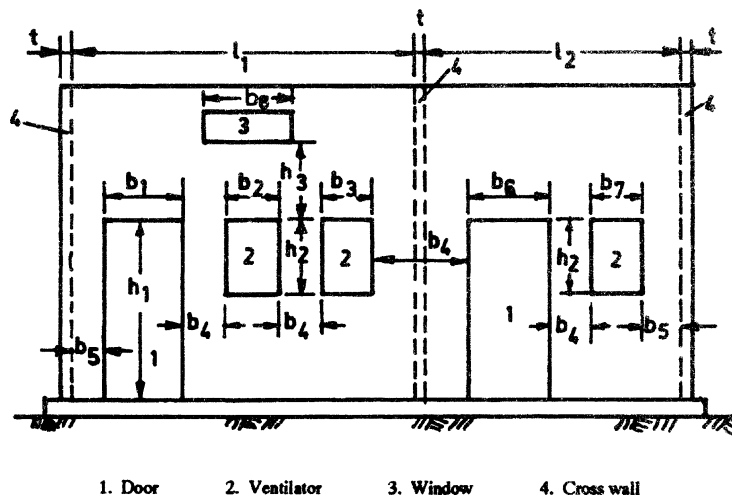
DIMENSIONS OF OPENINGS AND PIERS FOR RECOMMENDATIONS IN TABLE 4
